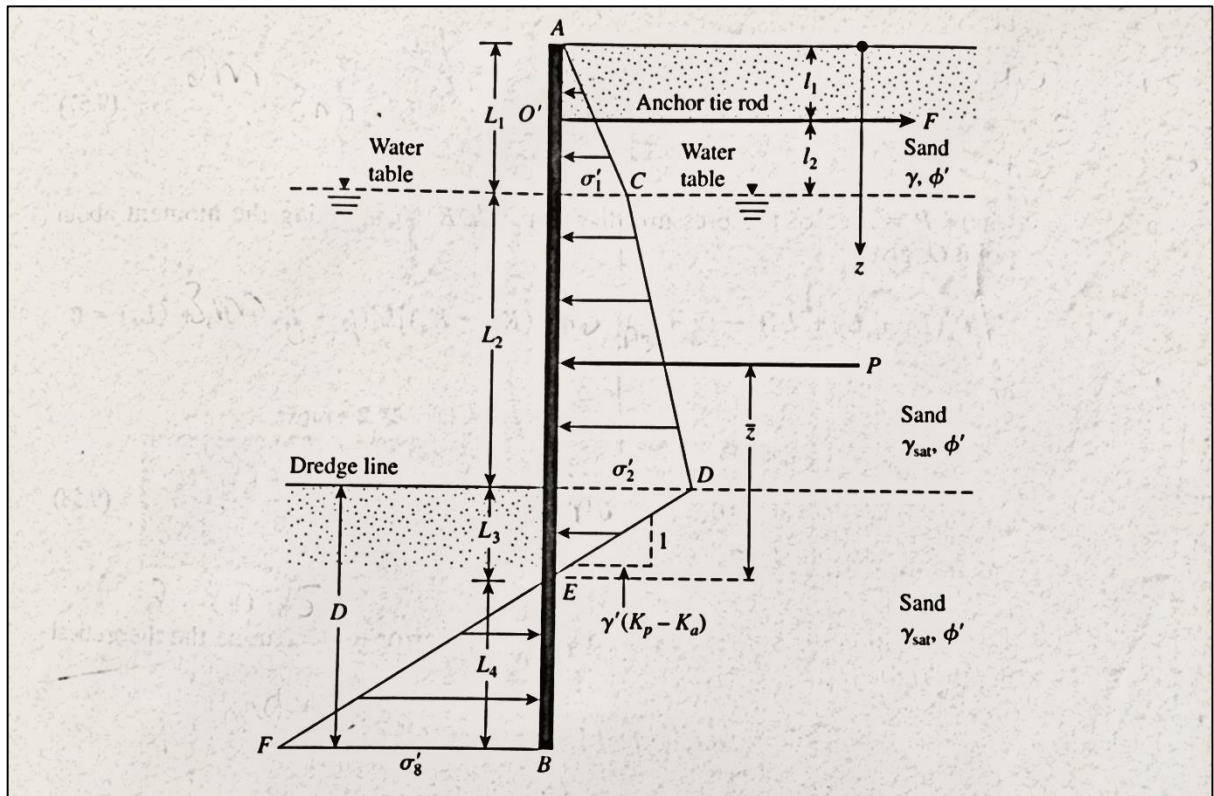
Net pressure distribution for the Anchor sheet pile wall in sand
